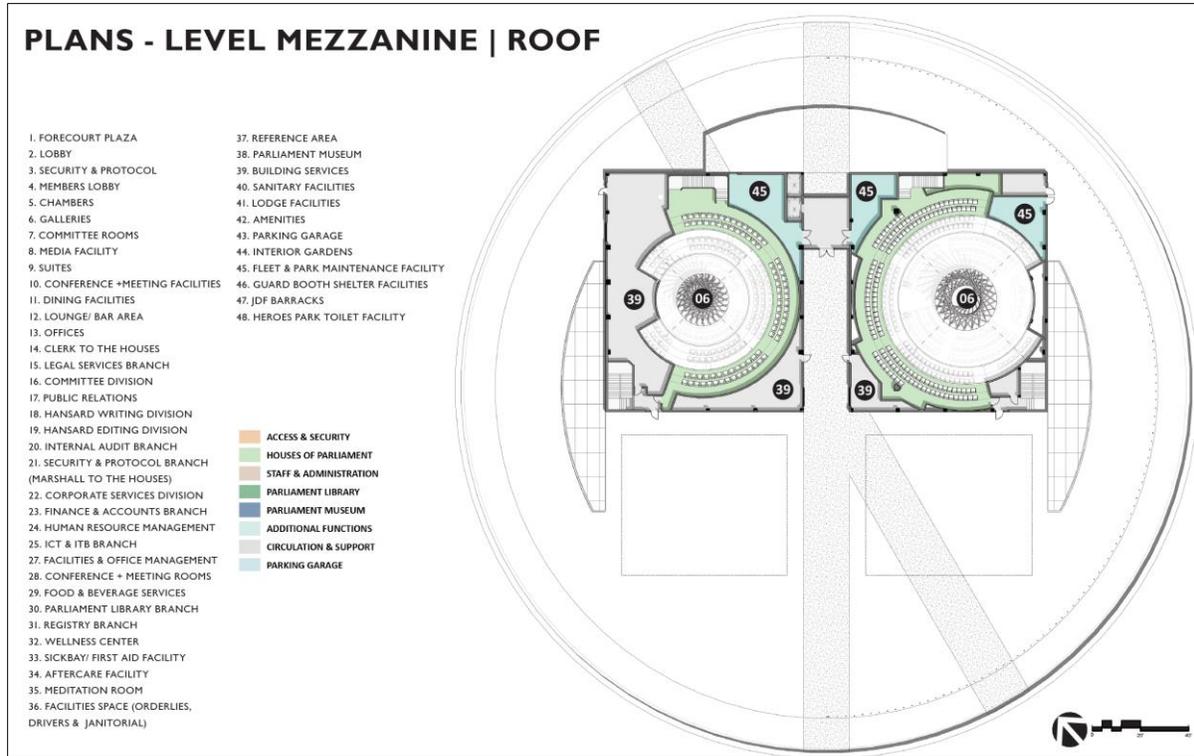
Houses of Parliament building plan – Level Mezzanine/ Roof
